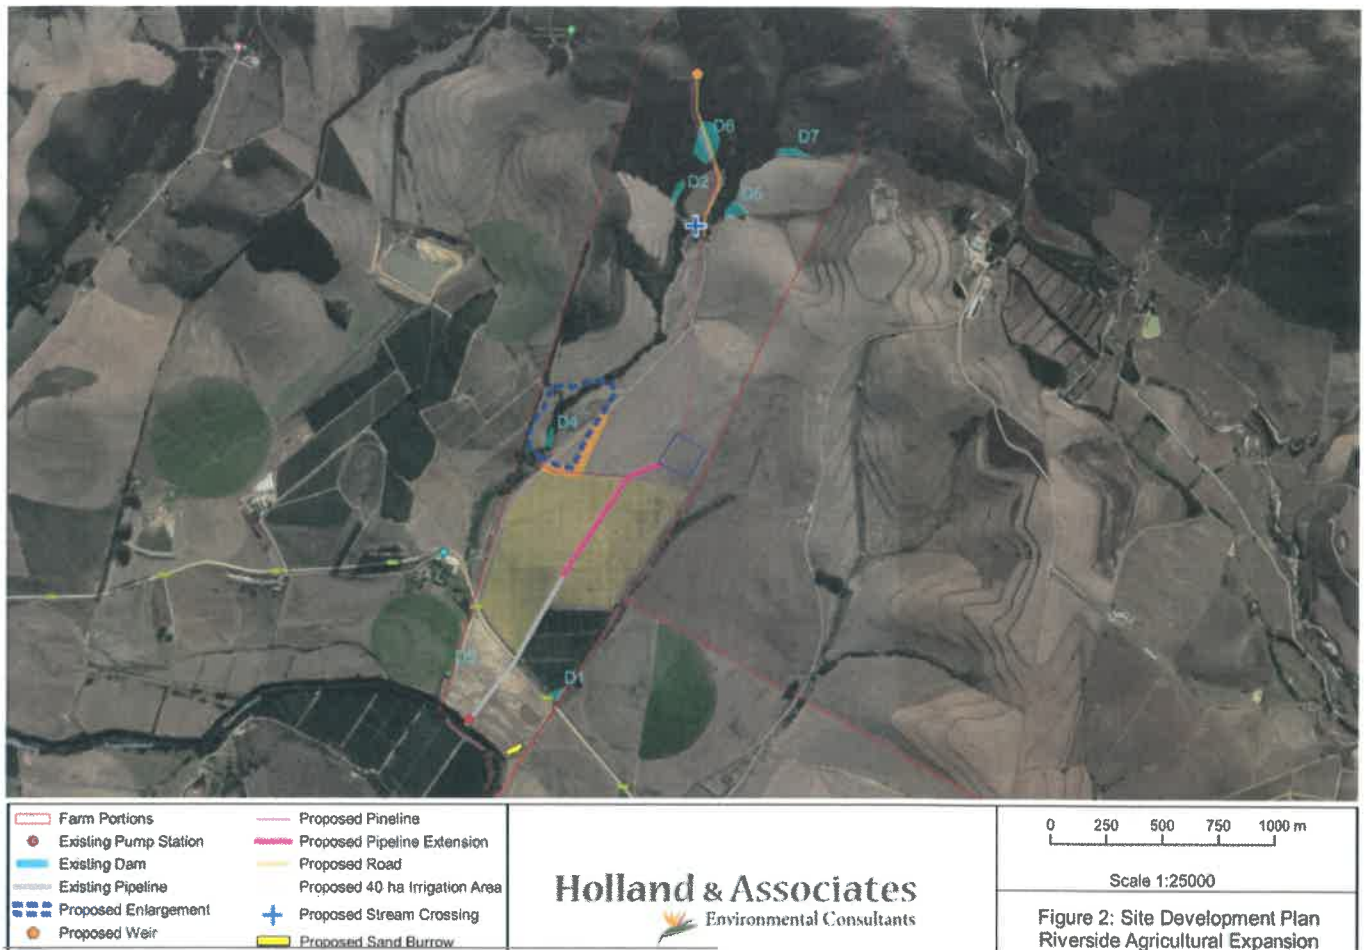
Site Plan of the areas for construction on Farm Riverside No. 211 and Remainder of Farm "The Oaks" No. 145, Greyton
